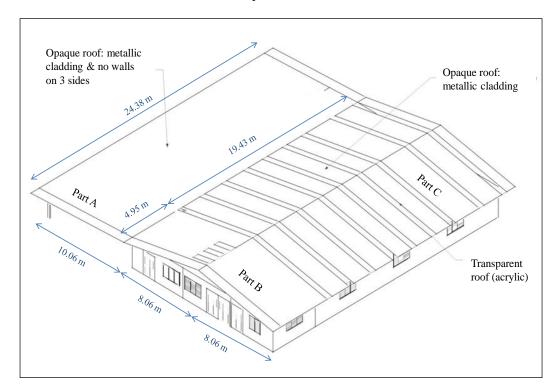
Original roof design of the freshwater prawn hatchery building showing measurements of the plan.
